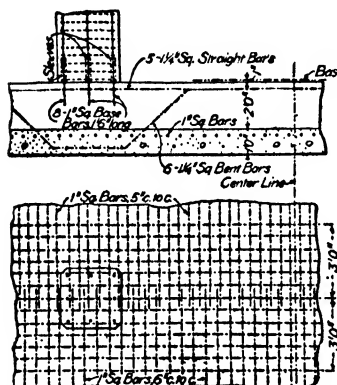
Mat Foundation Composed of Slab and Beams.
